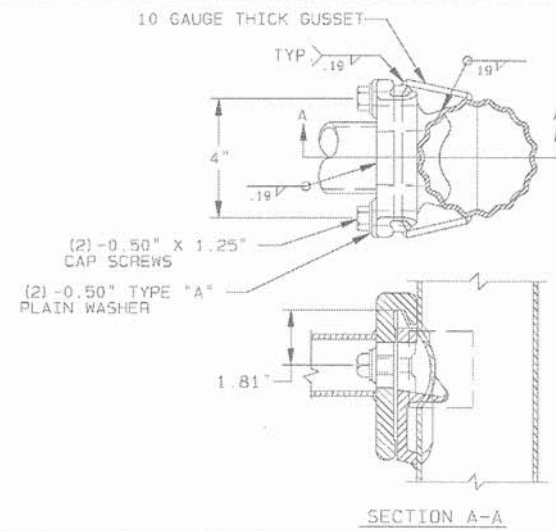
PINEAPPLE CAP ASSEMBLY
